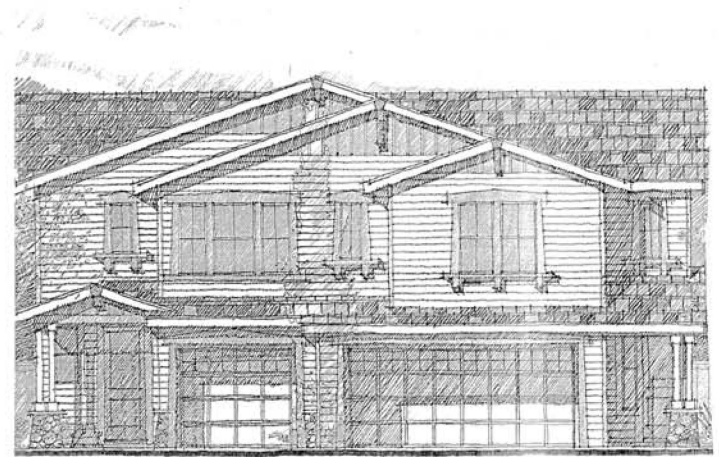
BUILDINGS A, B, & C STREETScape
